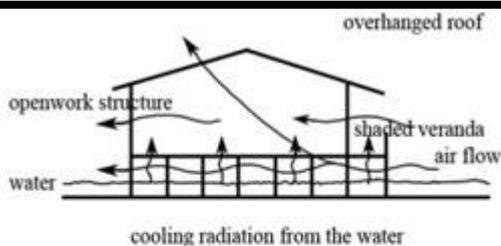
Natural cooling in Caribbean traditional houses with openwork structure built on stilts and located above water. Cross ventilation combined with the elevated floor and radiating cooling from the water surface. Drawing by author.
